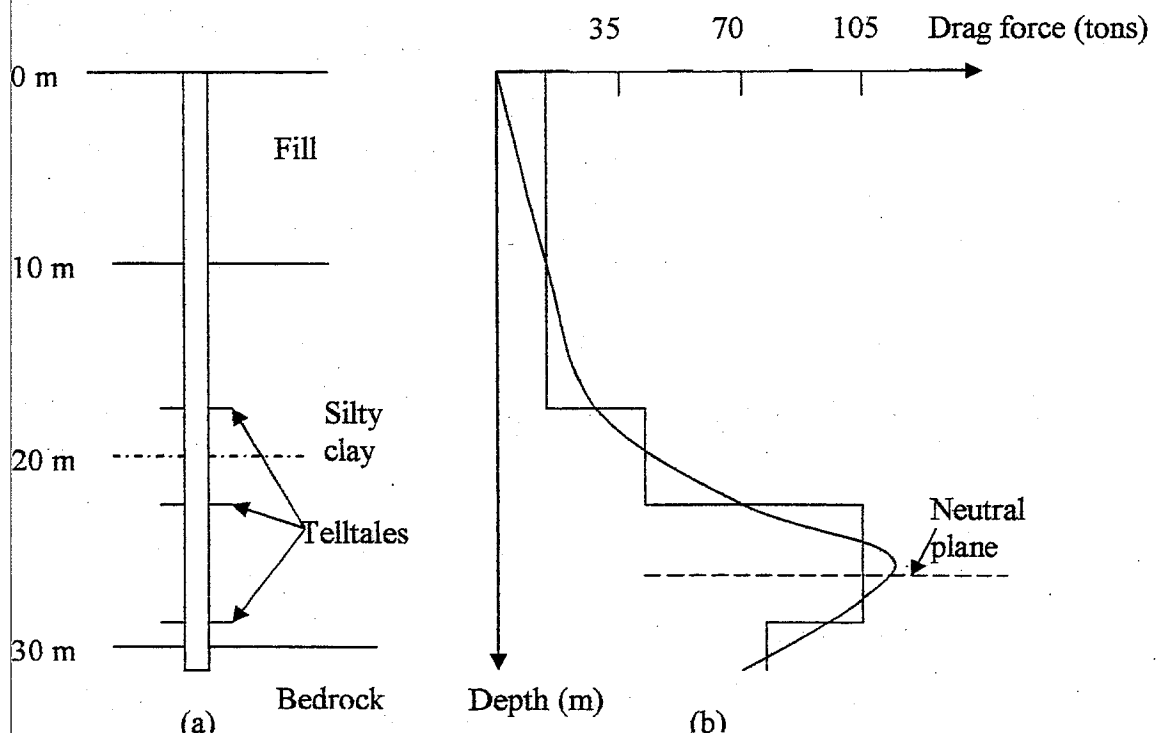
(a) Cross section of the subsurface with the test pile and the location of the
